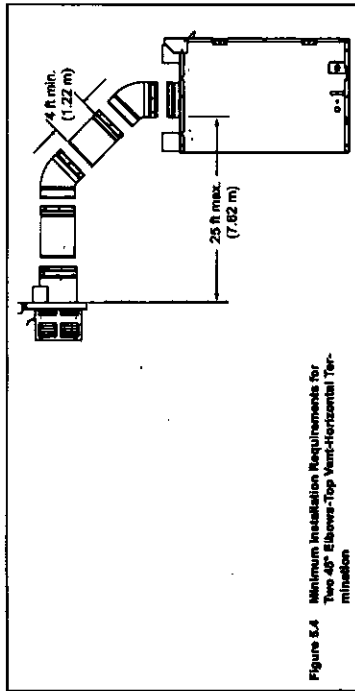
Minimum Installation Requirements for Two 45° Elbows—Top Vent—Horizontal Termination
